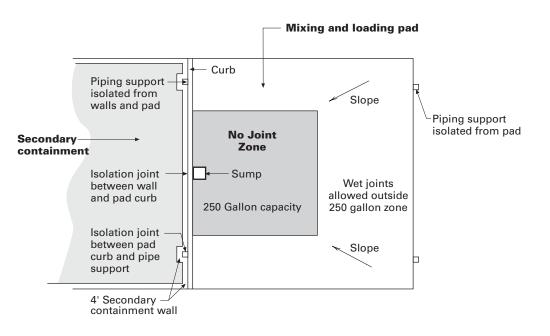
Common Joints in mixing and loading pad (side sump design). Note location of piping support outside mixing and loading pad.
